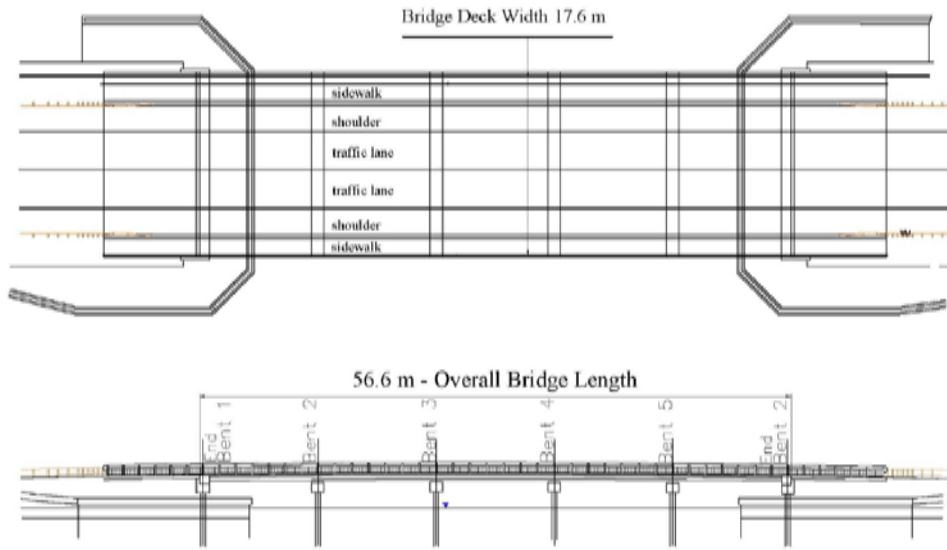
Plan and elevation view of the proposed FRP-RC Bridge.
